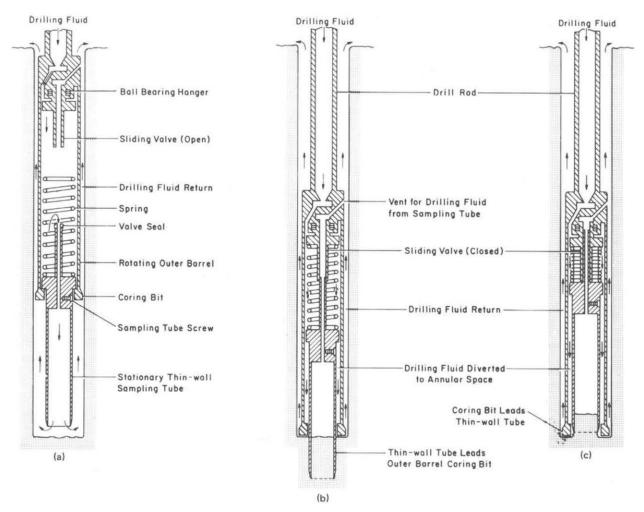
Pitcher sampler. Schematic drawing showing: (a) sampler being lowered into drill hole; (b) sampler during sampling of soft soils; (c) sampler during sampling of stiff or dense soils.
